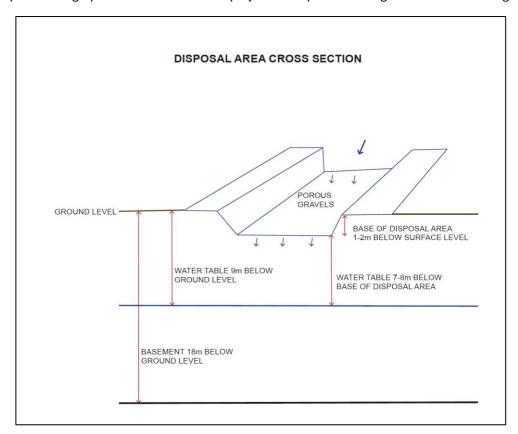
Cross section of typical ground discharge (source: Town Planning Group).
